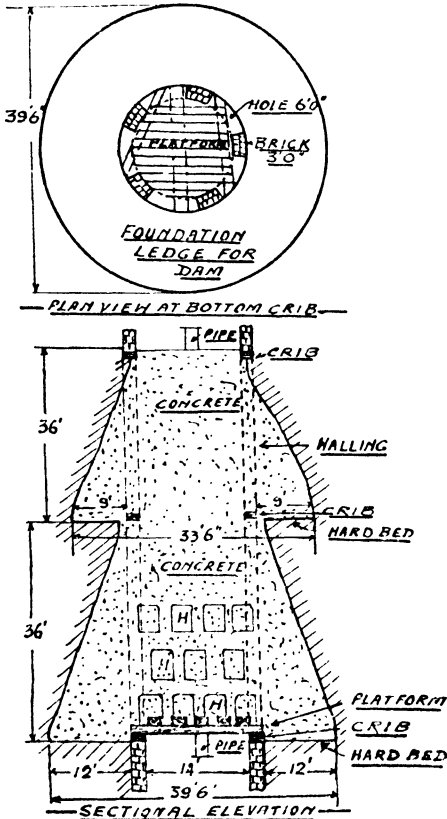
Construction of Cement-concrete Dam in a Circular Shaft.
